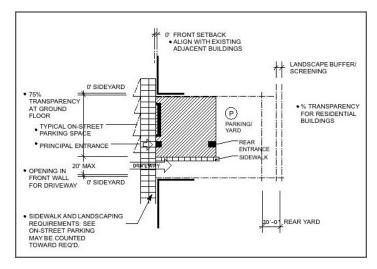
Site plan for typical small infill site (10,000sf site or less)
